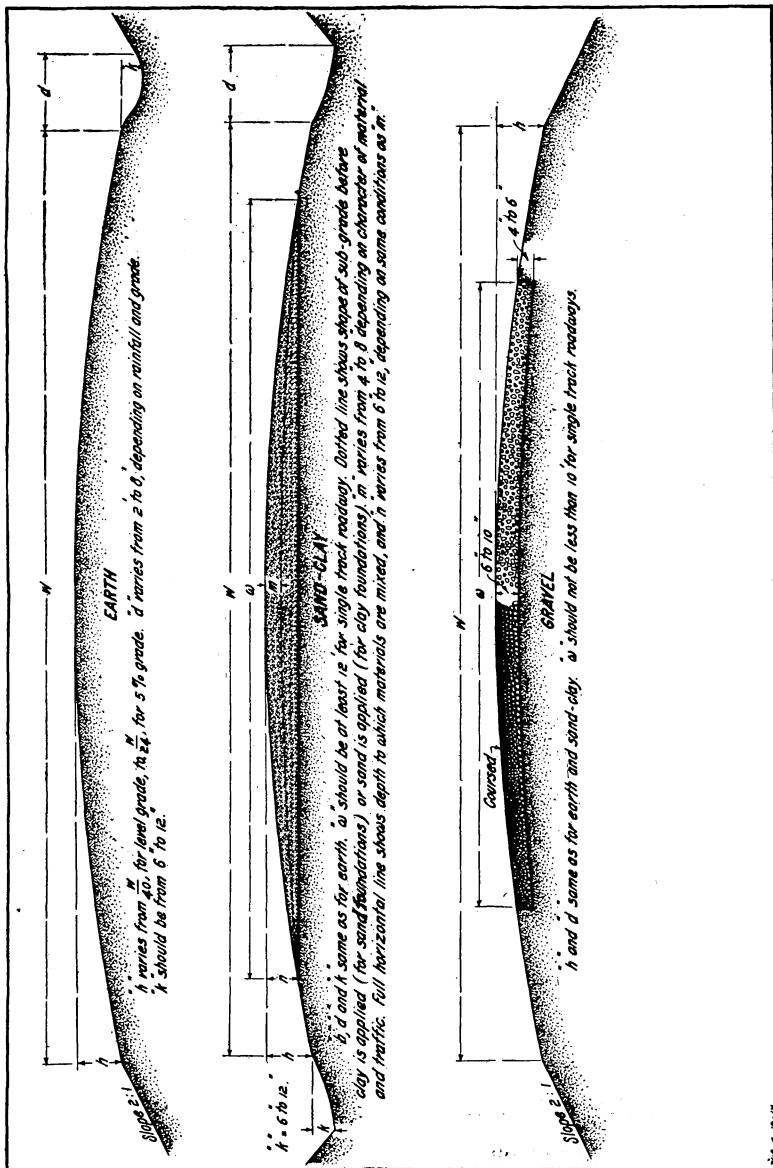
Cross section showing typical construction of earth, sand-clay, and gravel roads.
